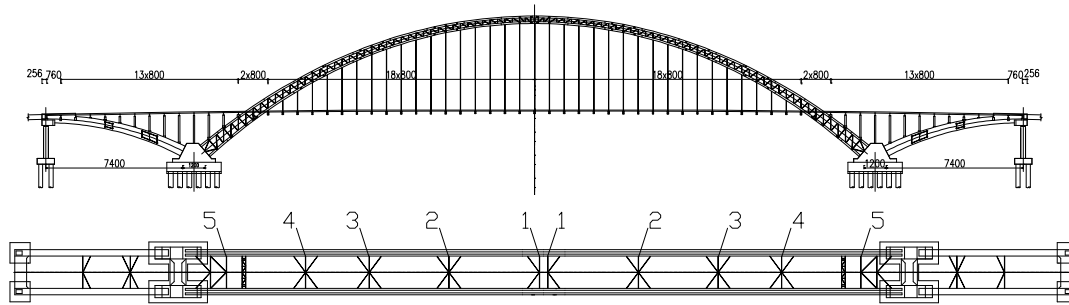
Layout of *Maocaojie* Bridge and settings of cross beams
